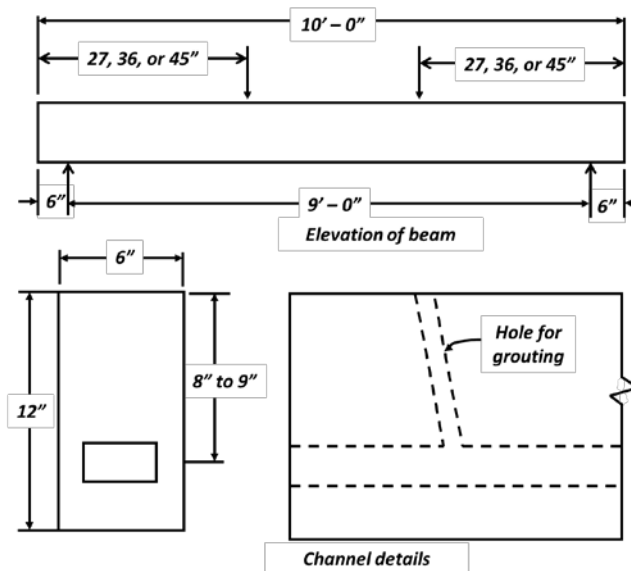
Typical Detail for Test Specimen by Warwaruk (1960)
